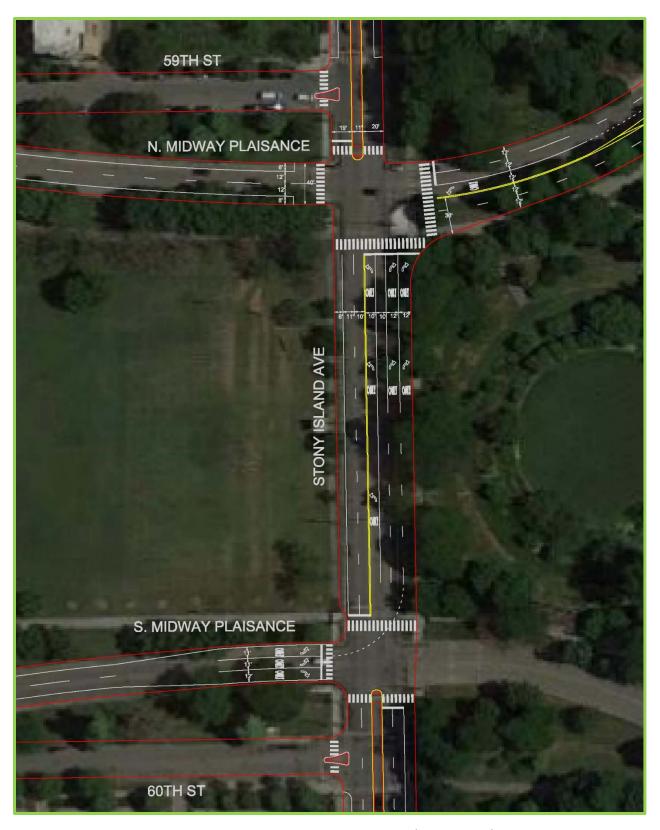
Stony Island Avenue at Midway Plaisance / 59th Street / 60th Street Mitigation
